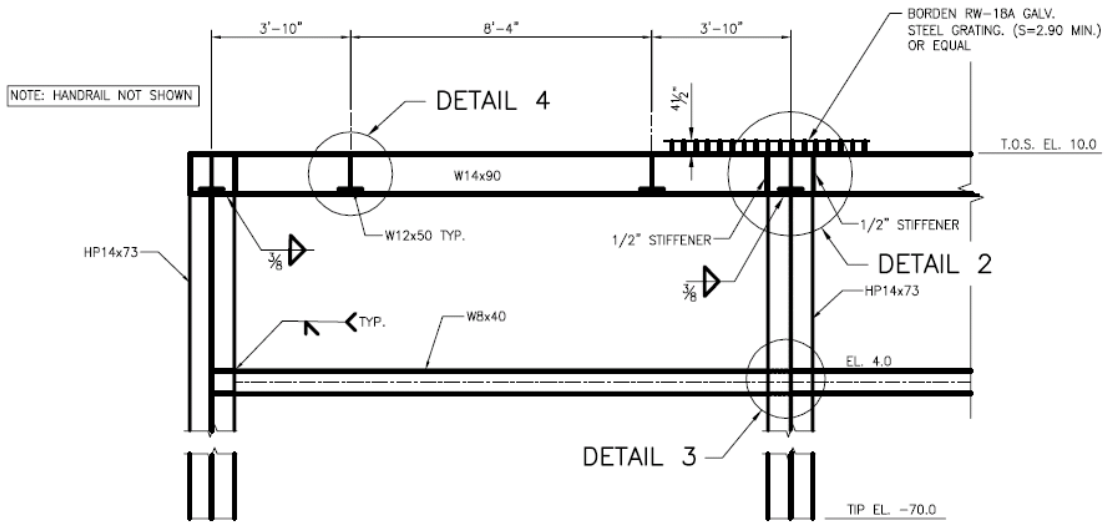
Orleans Avenue Phase 1 Pump Platform Structural Section
